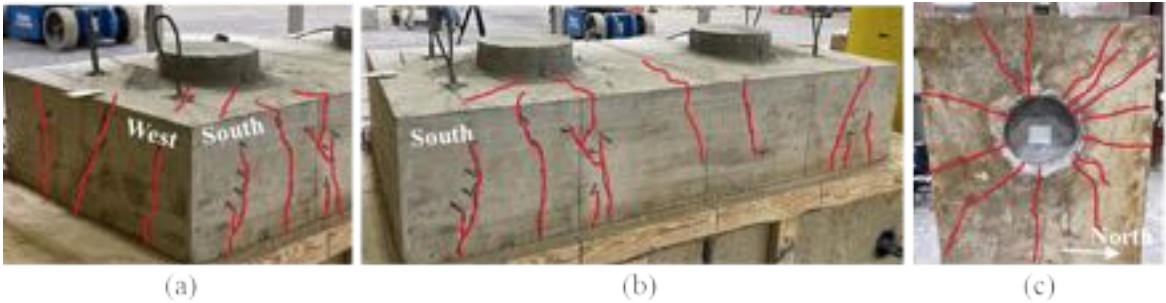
Failure and cracking pattern of Specimen MP-2 on (a) south-west view, (b) south view, and (c) bottom view
